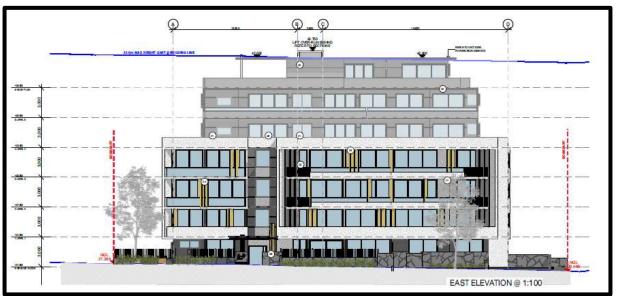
Front elevation of approved residential flat building at 5-9 John Street, Kogarah Bay (DA2017/0663) (Source: UrbanLink).
